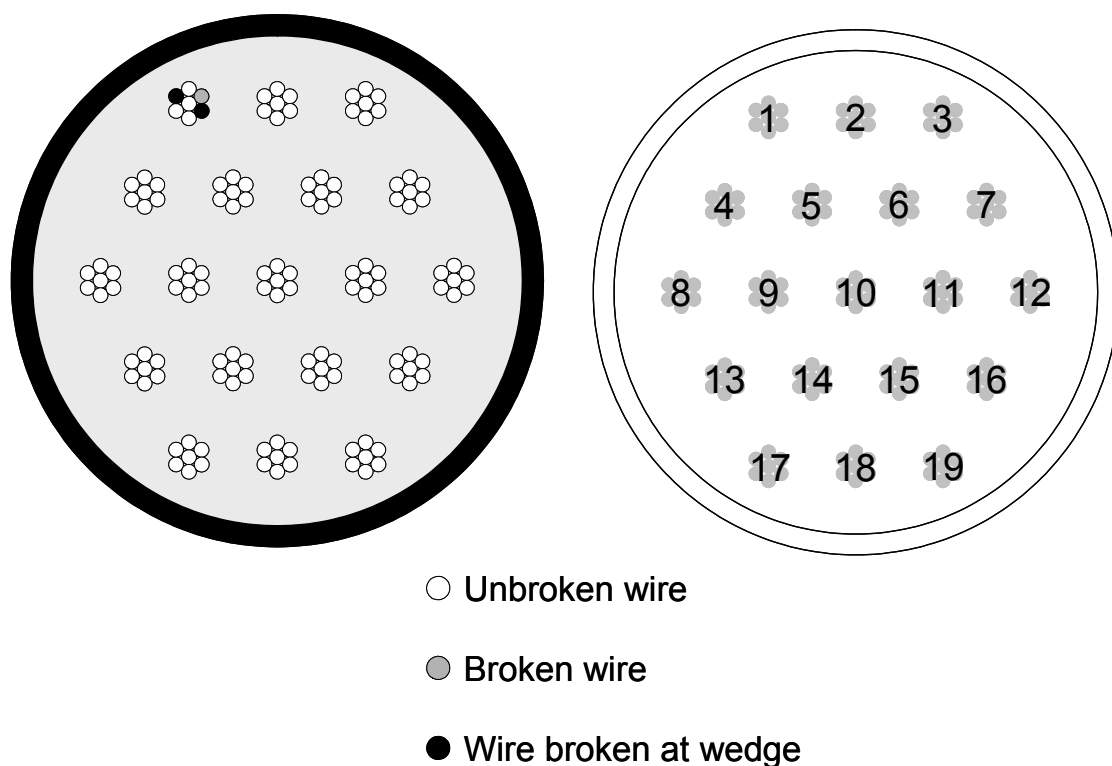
Wire breaks at deck anchorage - Specimen 9
